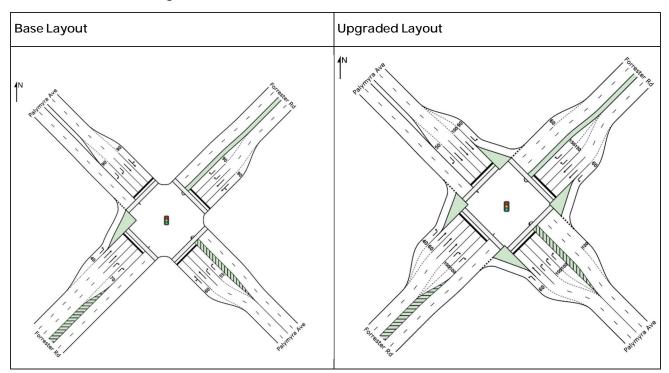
2031 with Links Road extension - Palmyra Avenue/Forrester Road
